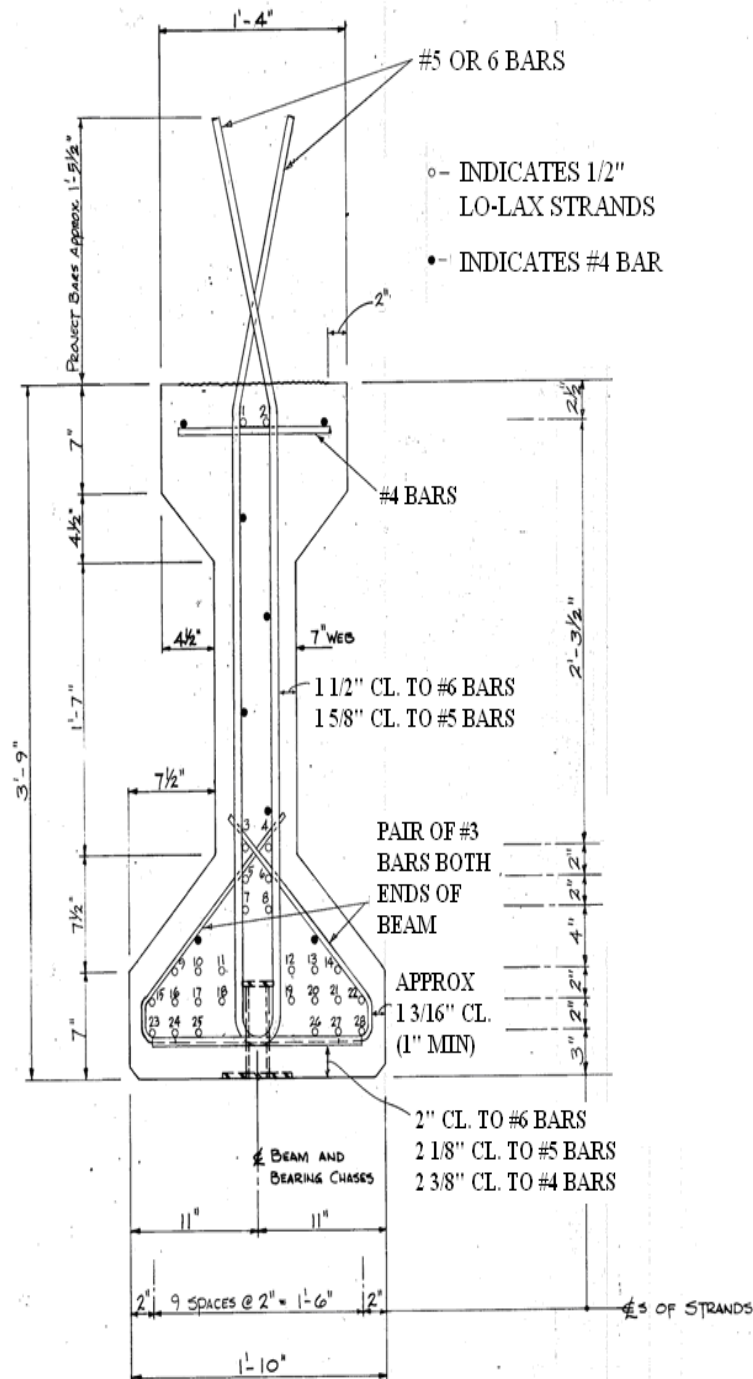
Type III Prestressed I-Girder Cross Section (Ref. GDOT Drawings)
